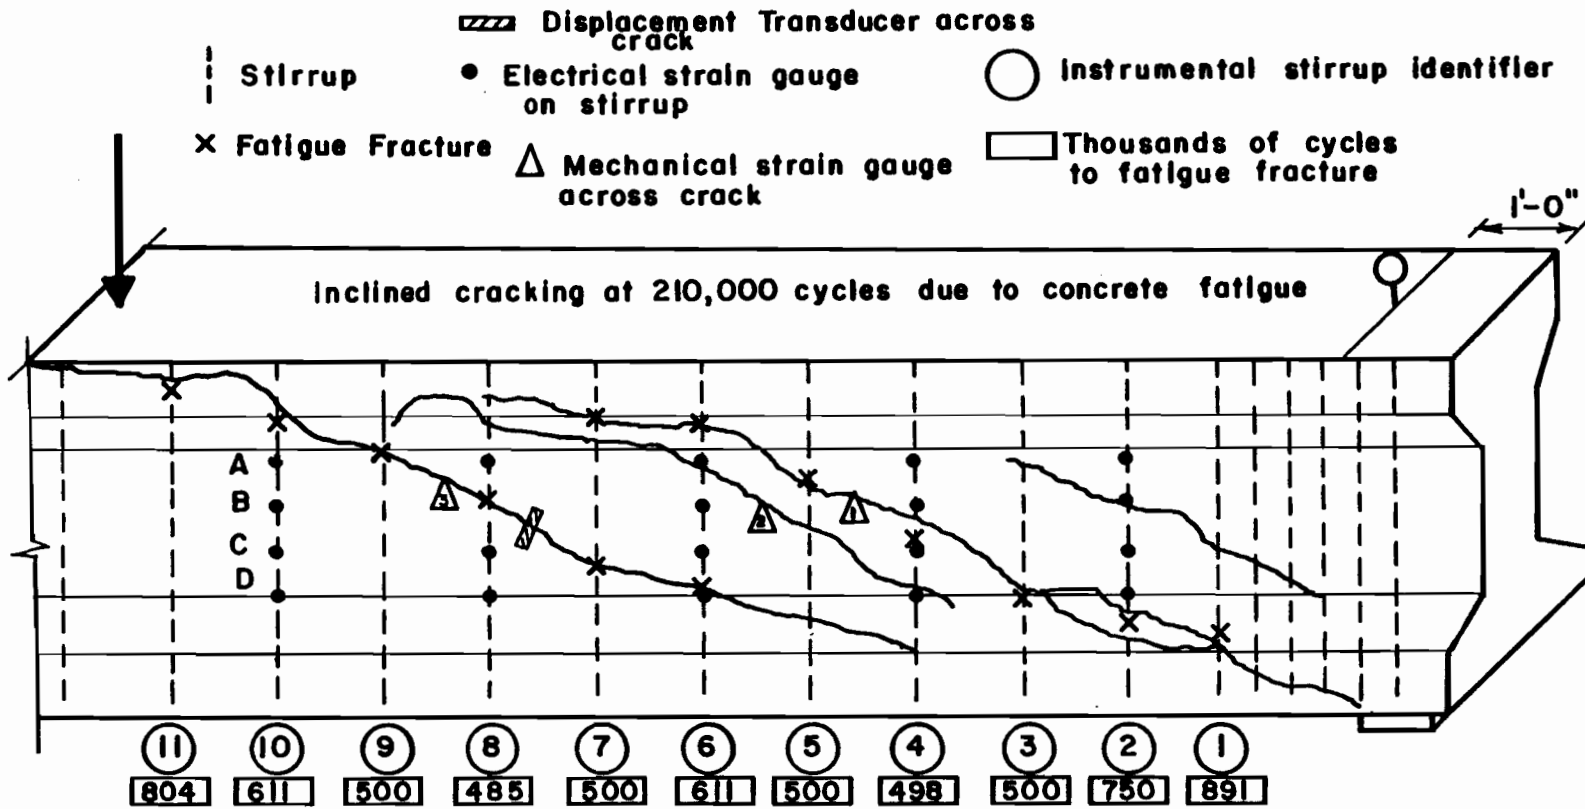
Beam 2, south shear span; instrumentation, crack pattern, and fatigue fractures
